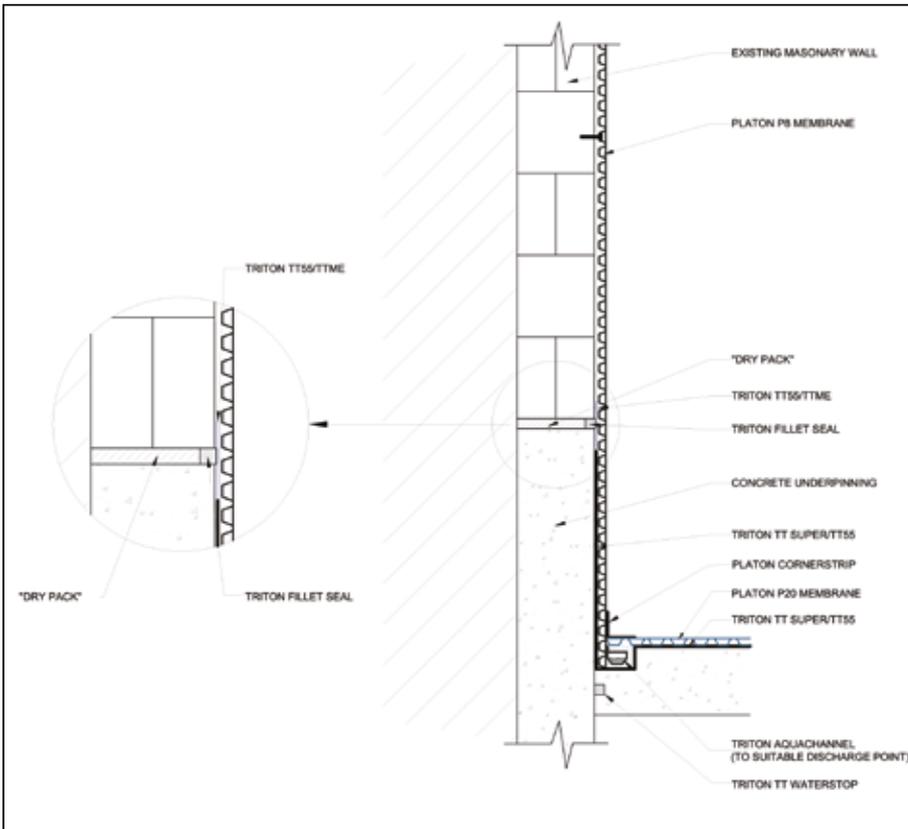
Diagrammatic layout of typical Type C cavity drain system.
